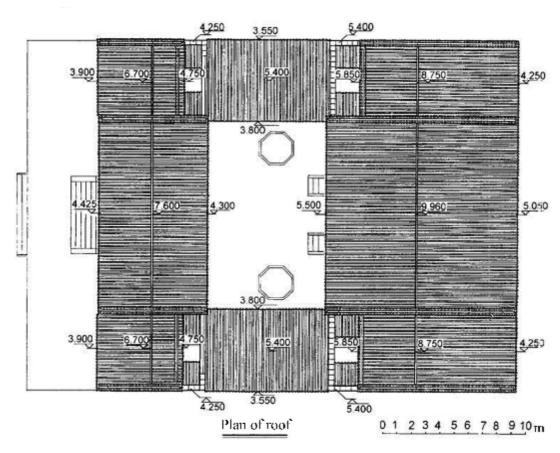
The roof plan of Canton Chen Daifu Ancestral Temple.
